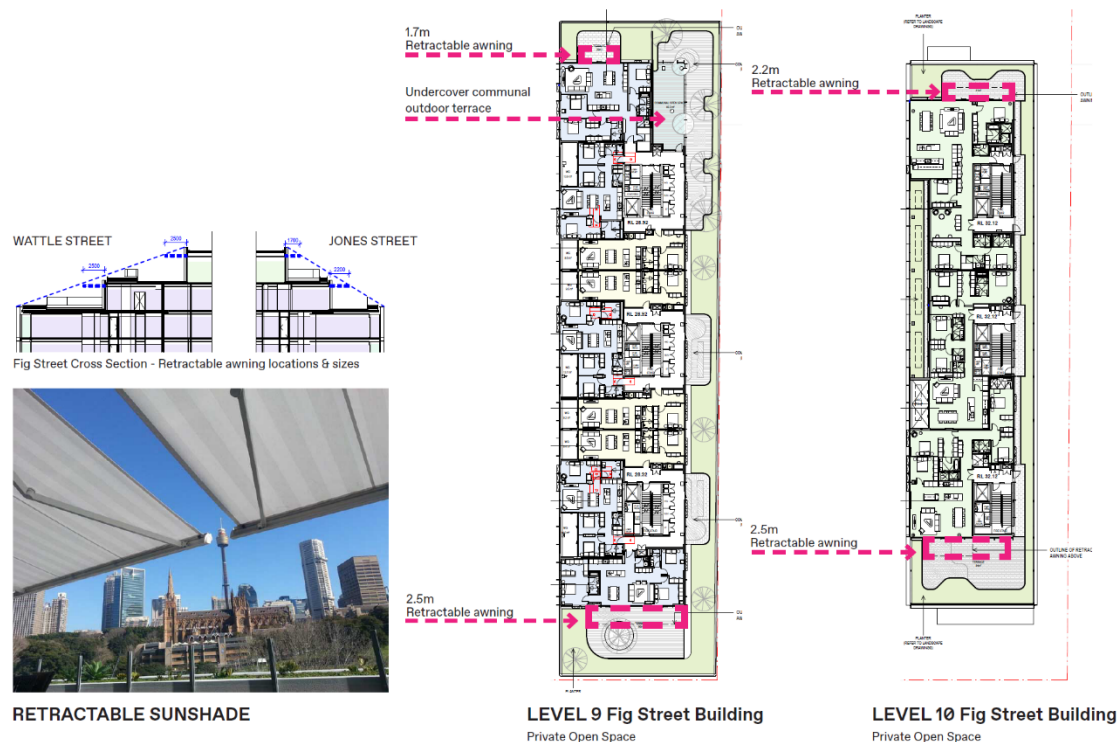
Sun shading: Proposed Level 09 and 10 retractable awnings to private open space
